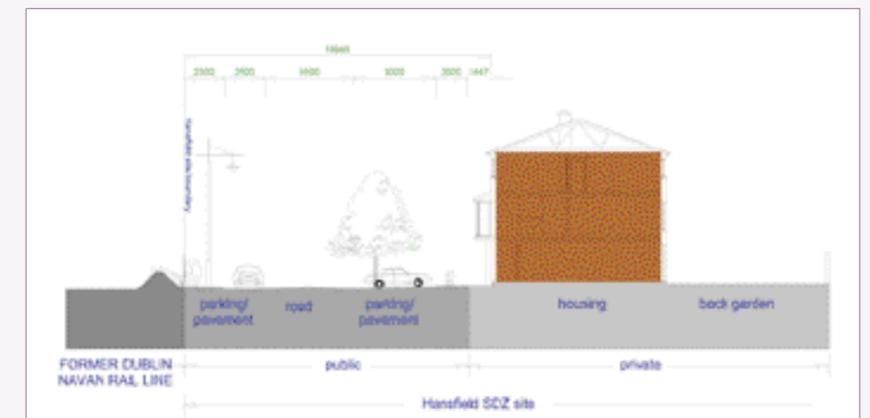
Section through Boundary of former Dublin - Navan Rail Line
